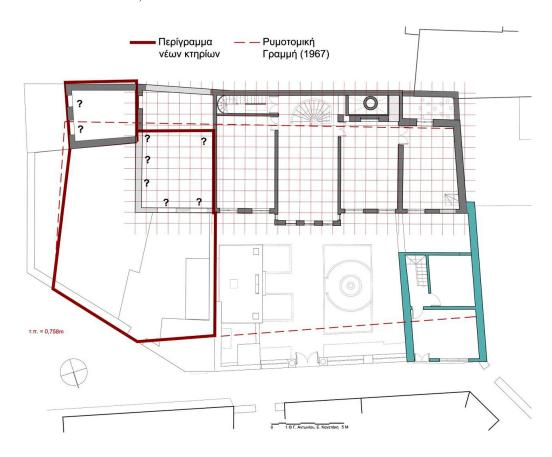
First floor plan indicating the constructional phases. The modern building is indicated with a red outline. Source: G. Antoniou, 2016
